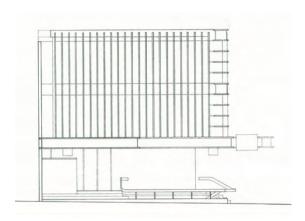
East Elevation showing vertical louvres, and curving steel handrail leading down to basement restaurant. *Drawn Ted Quinton 2006.
